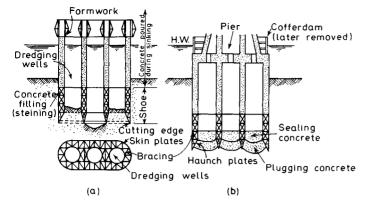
Stages in sinking an open caisson. (a) Grabbing from cells and concreting in walls; (b) plugging and sealing concrete in place with caisson at final level
